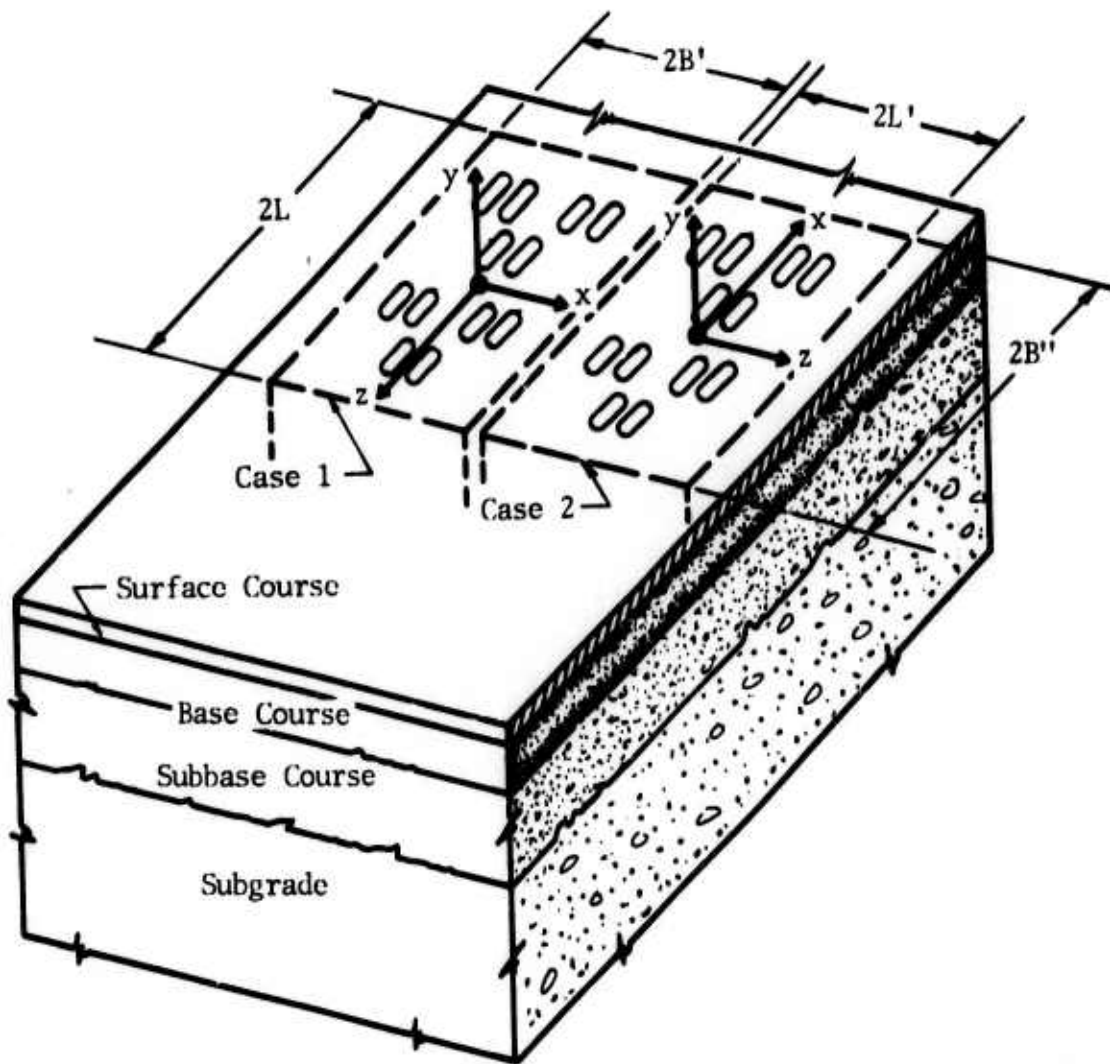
Alternate Idealization of Pavement Structure Loaded by C-5A Aircraft
